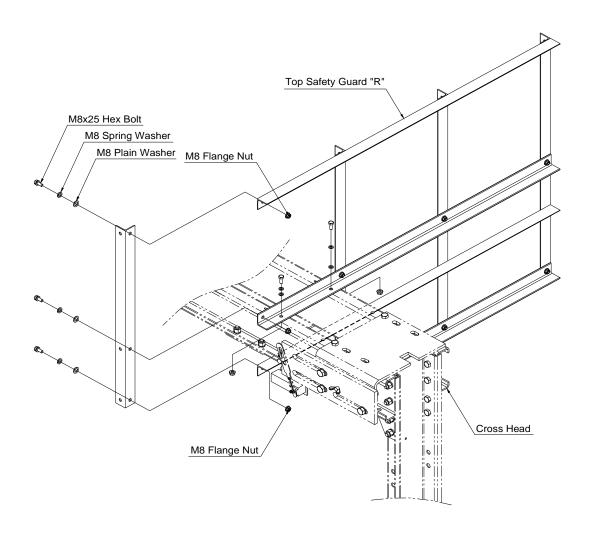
B. CAR TOP SAFETY GUARD (RIGHT SIDE) INSTALLATION (Underslung Fork type)
